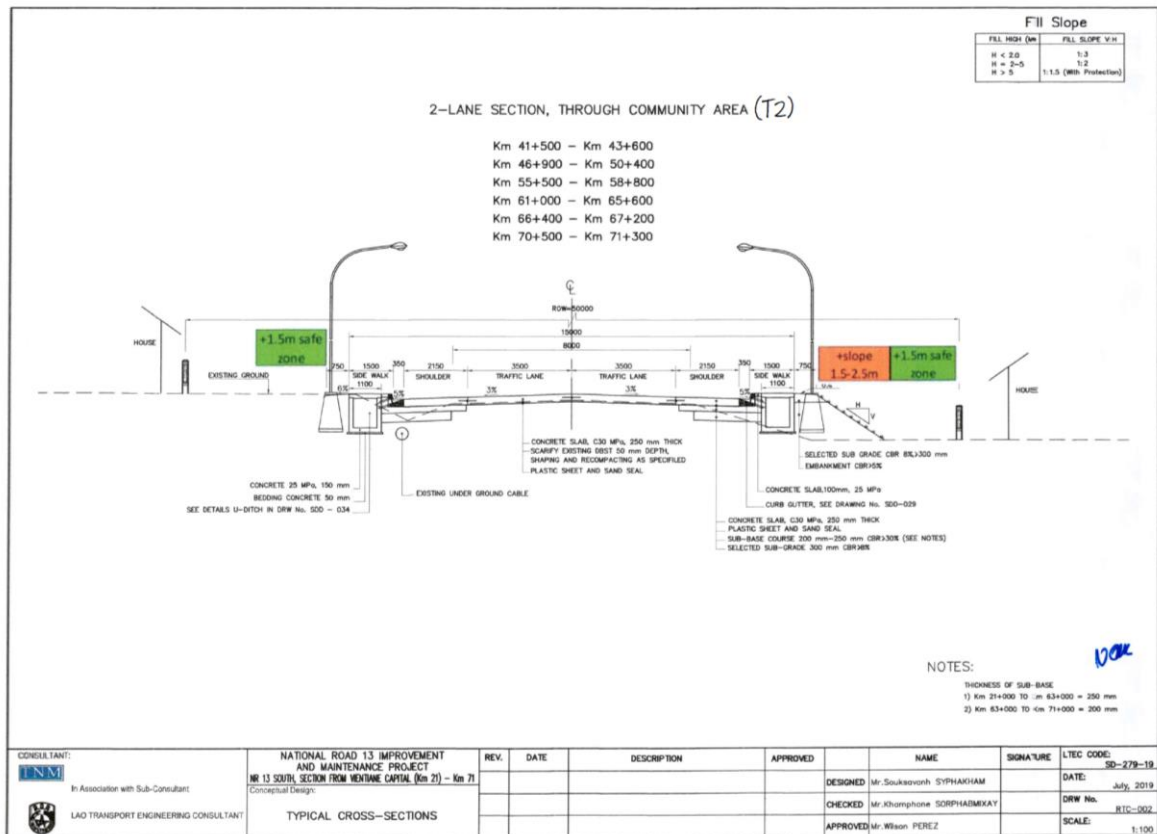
Typical Cross-Sections of 2-Lane Section through Community Area (T2)
